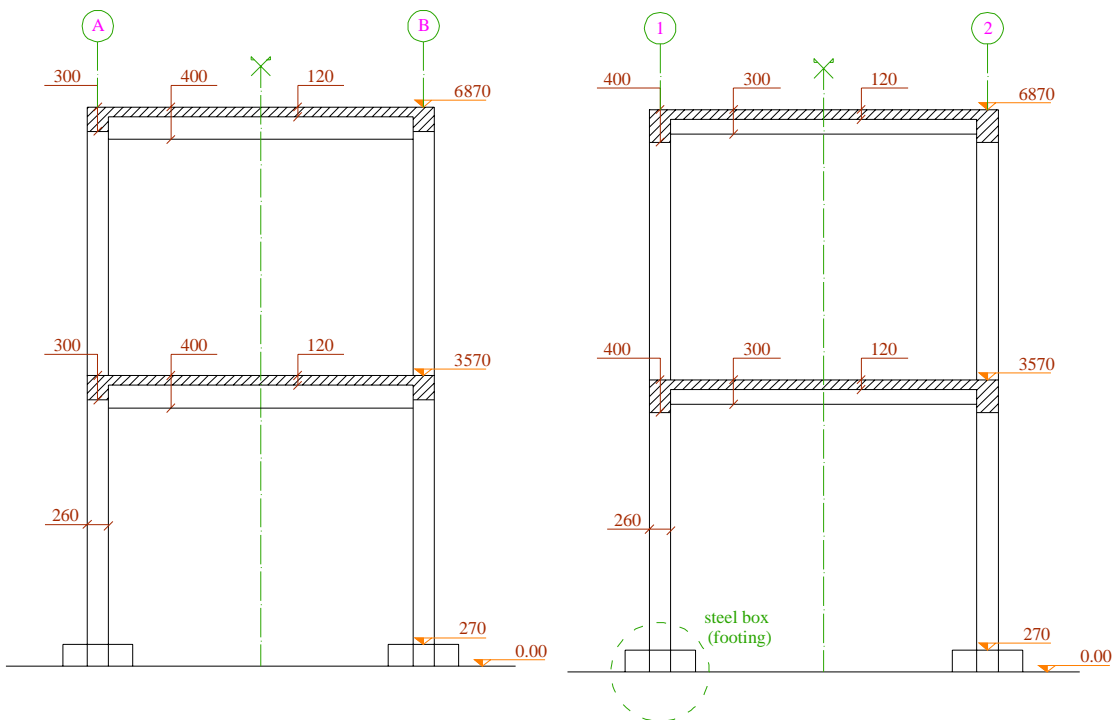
Section I-I (left) and Section II-II (right) of the building
